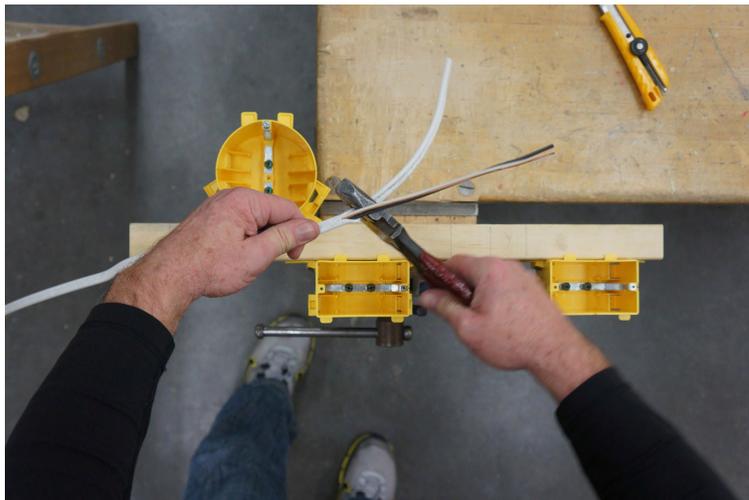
, 15b, 15c—Cutting sheathing and finished cut sheathing
